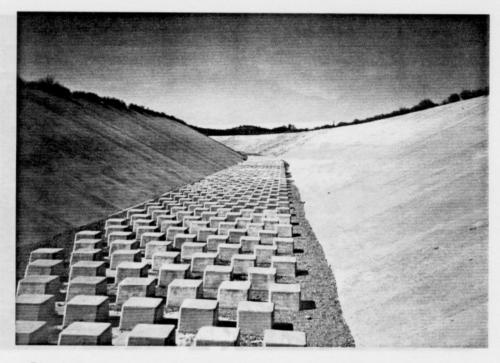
Flood Control Outlet Works Outlet Channel (looking downstream at baffle blocks from within channel).
